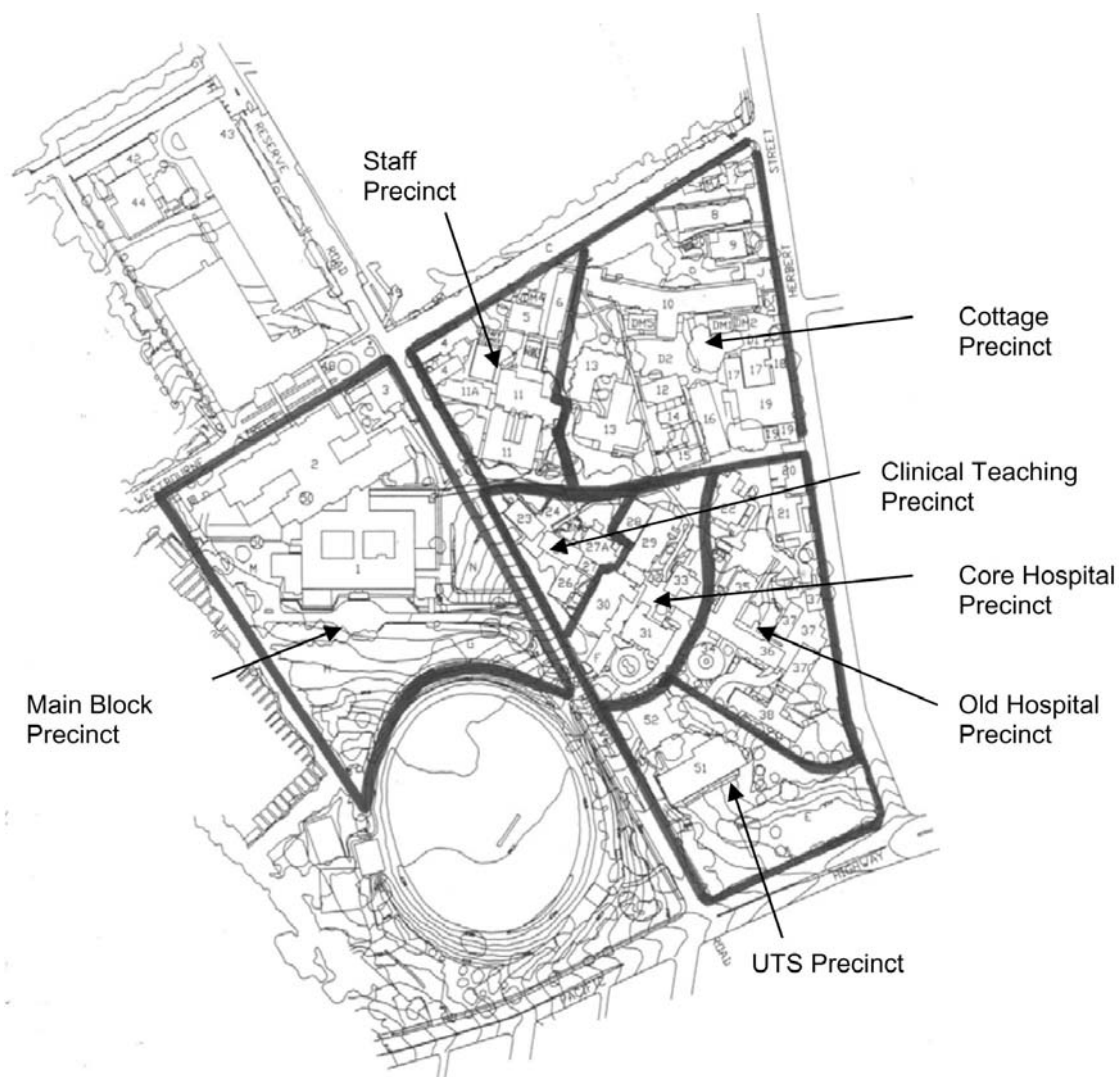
Site plan showing the Royal North Shore Hospital precincts. (Source: City Plan Heritage, 2005)
